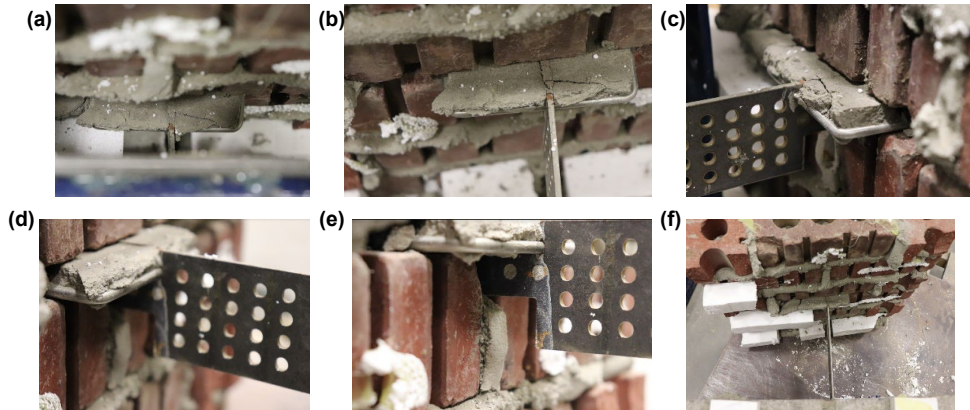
T-PV.CL-1* after testing of (a) top view of embedment failure, (b) alternative view of embedment failure, (c) side view, (d) alternative side view, (e) lower connector portion view, (f) top view
